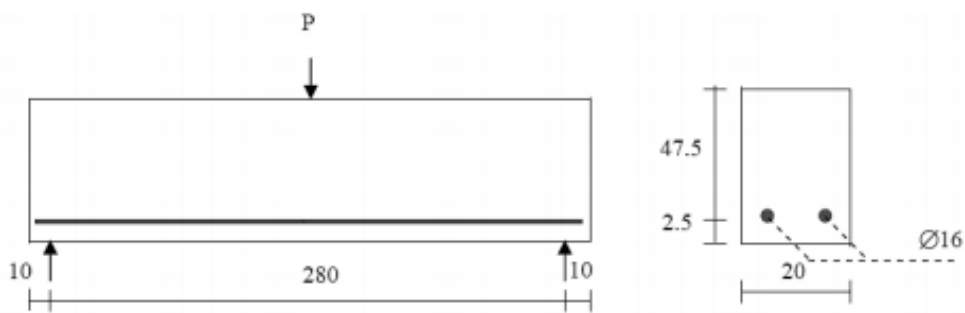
Geometry, loading and beam reinforcements (dimensions in cm)
